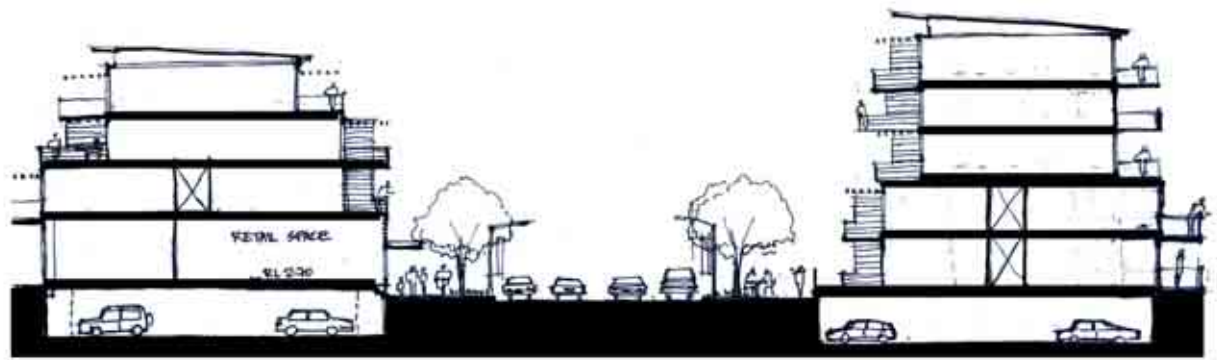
Proposed Section of the Entrance Road at and north of Tuggerah Parade
